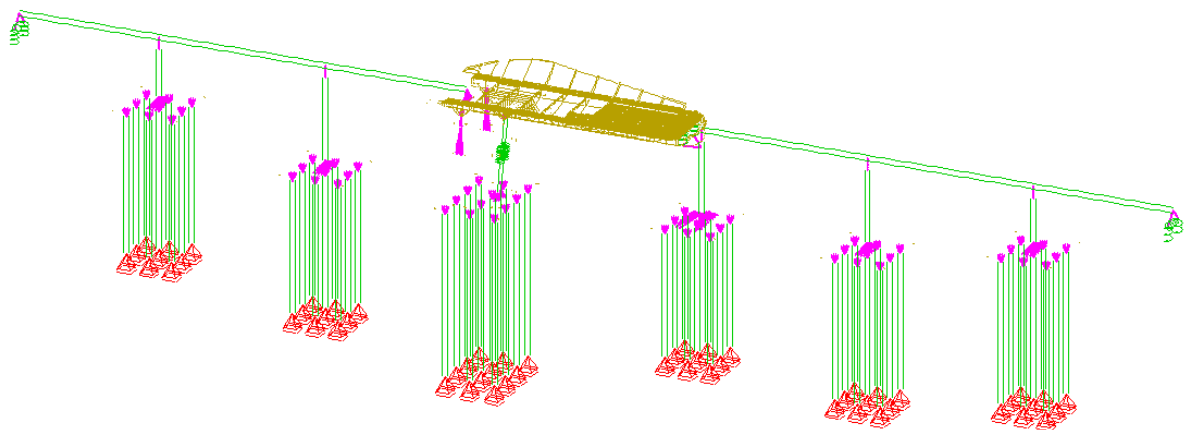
Swing Bridge Replacement (SBR) Global Model – 3D Isometric view with Lift Span deck in closed position (open to vehicle traffic)
